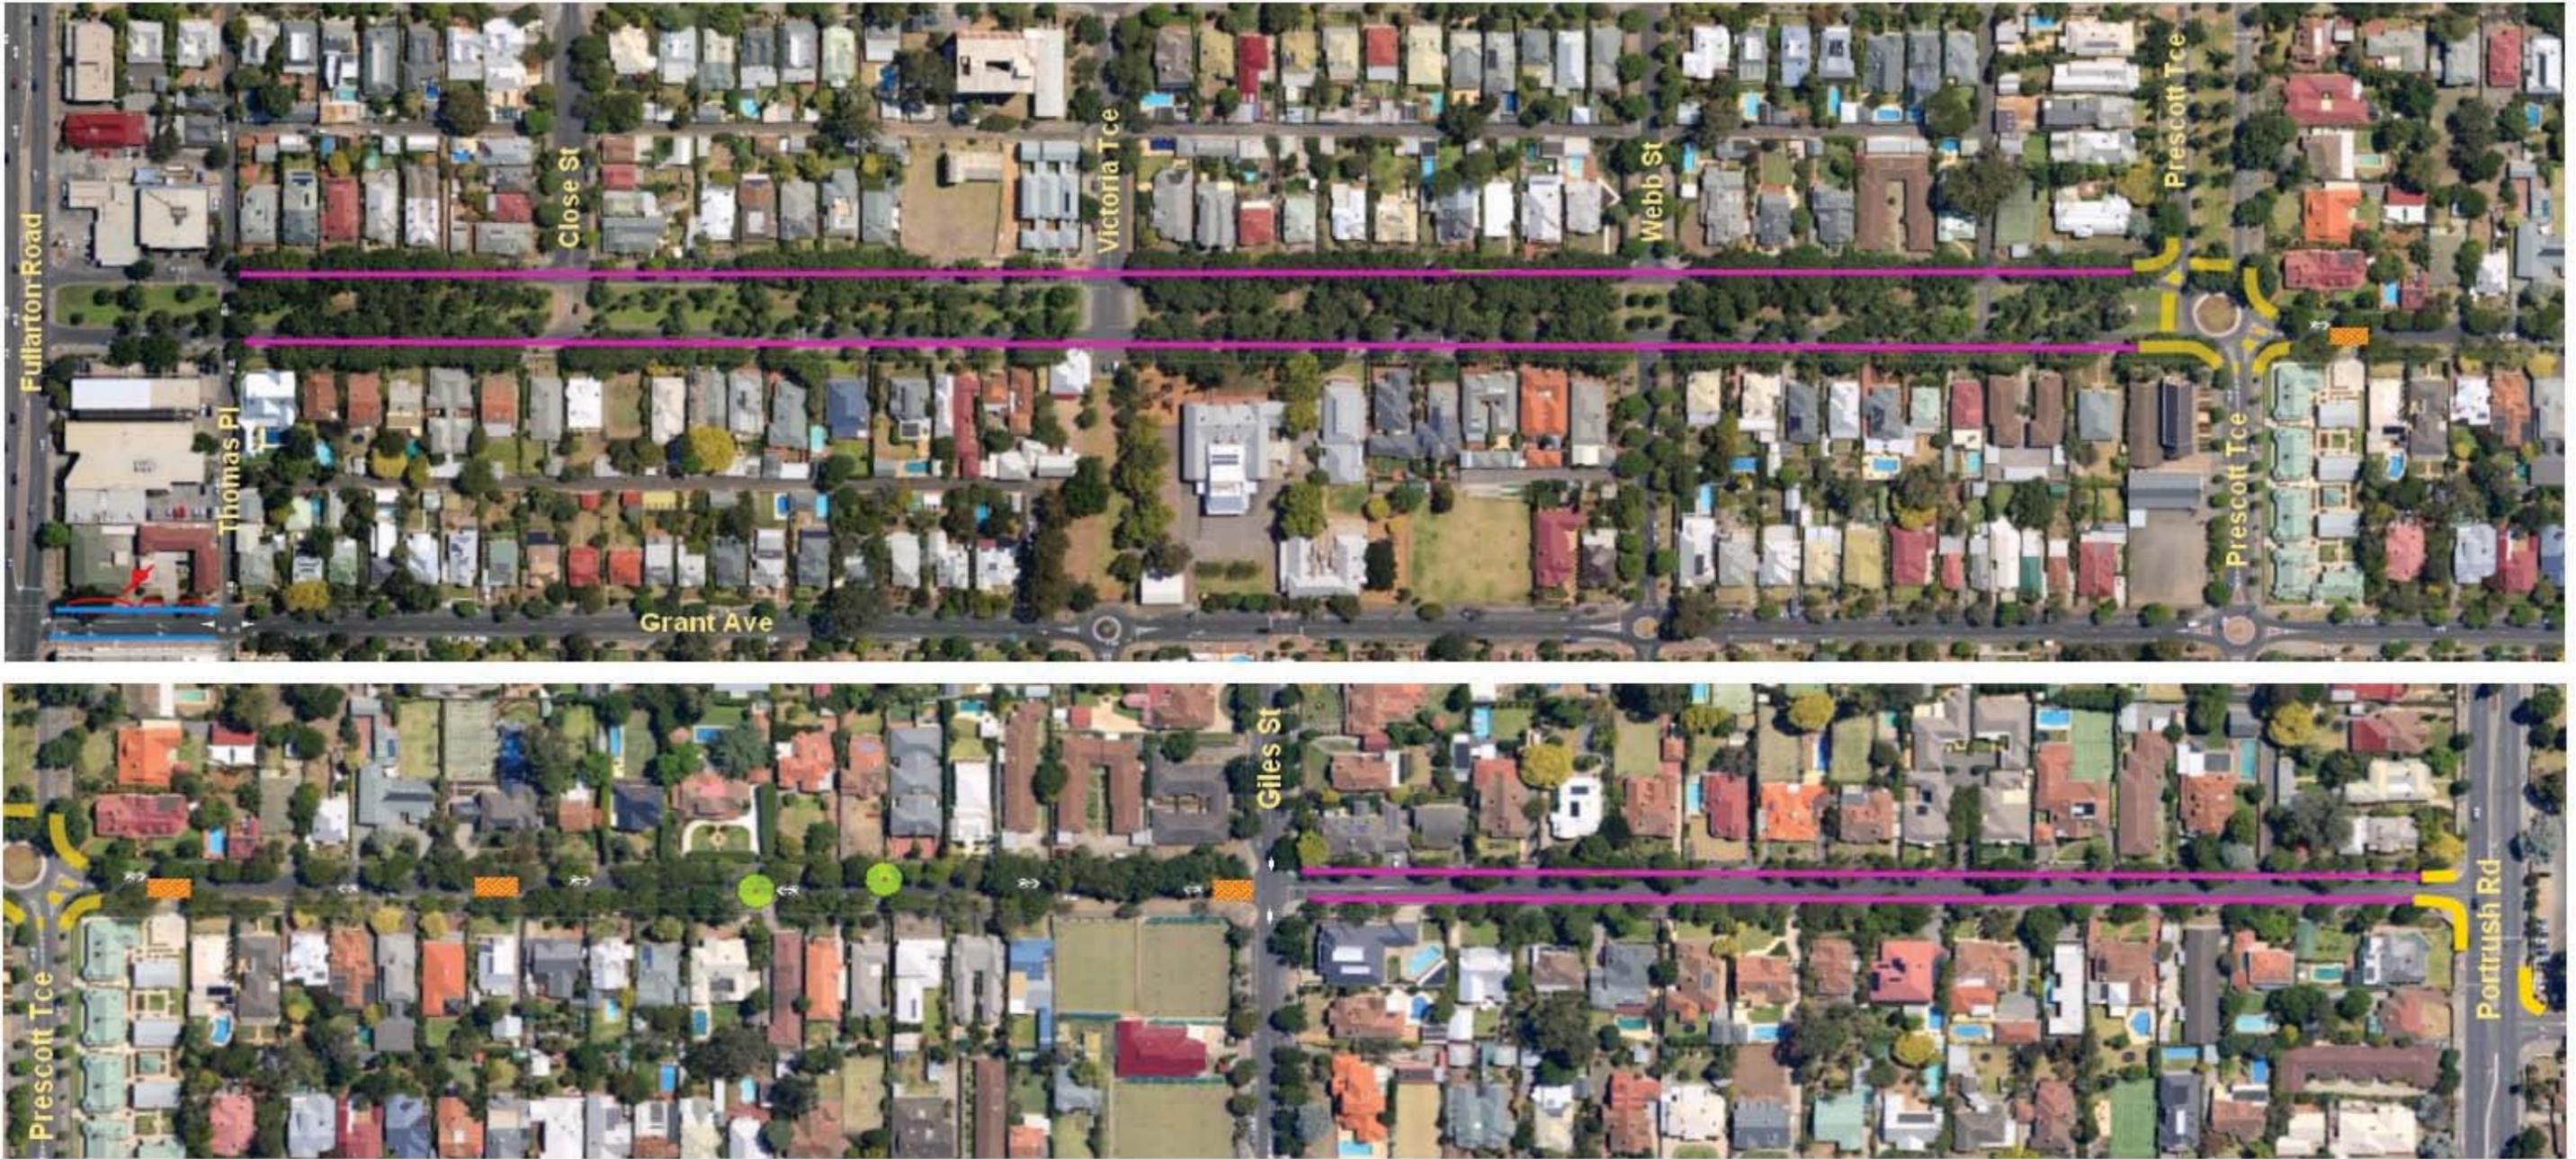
Alexandra Avenue, Fullarton Road to Portrush Road
